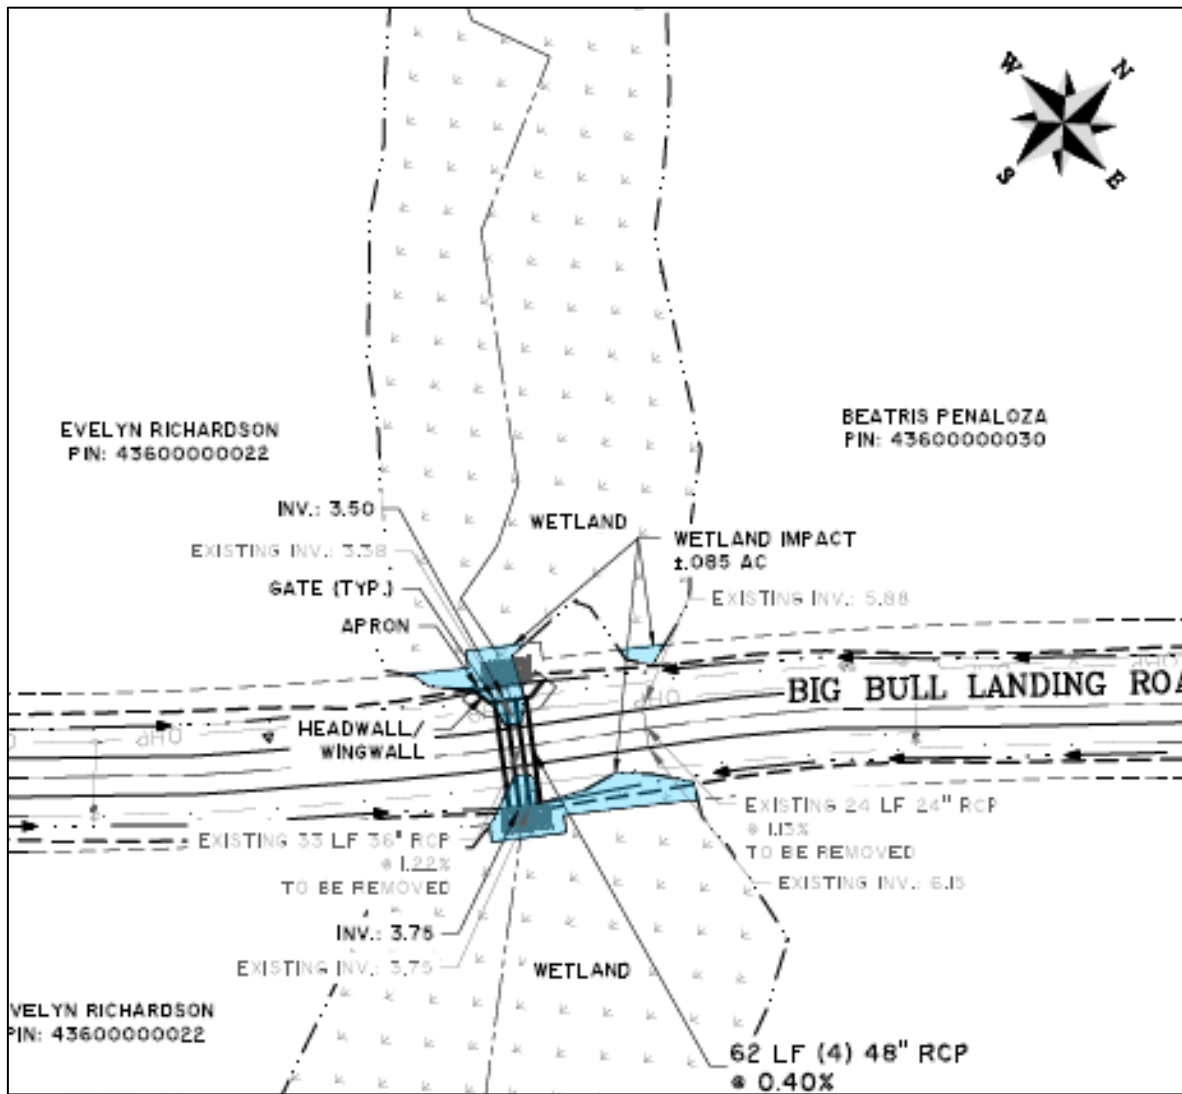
Site Plans of culverts and wetlands for Big Bull Landing Road Raising
